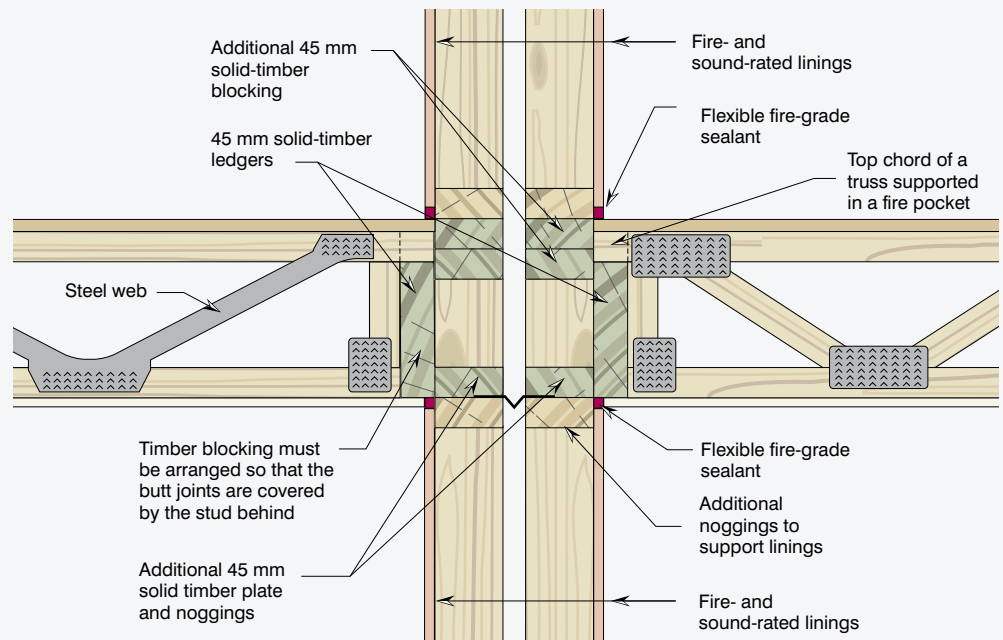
Alternative floor-truss top chord support – FRL 60 minutes – elevation view.
